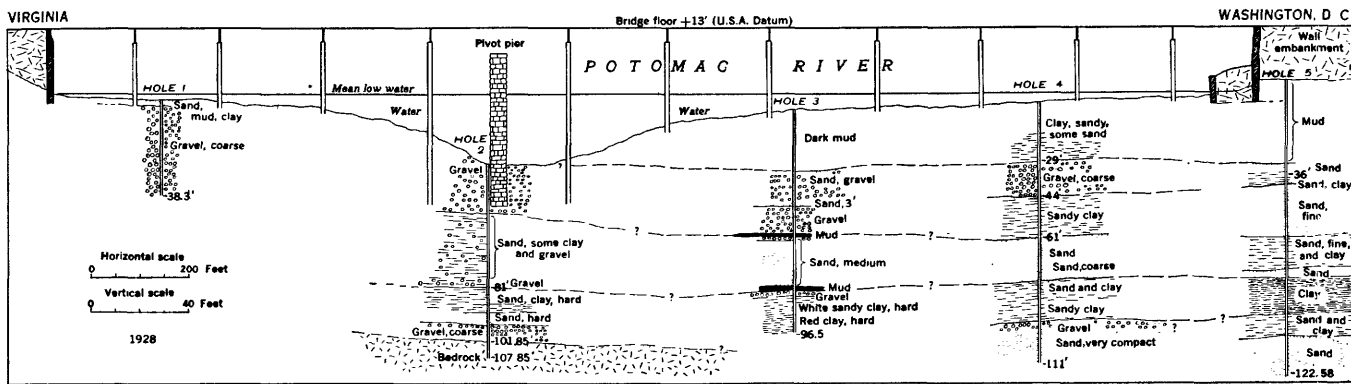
Section across Potomac River at railroad bridge, showing boreholes by Southern Railway. (Datum mean low tide.)
